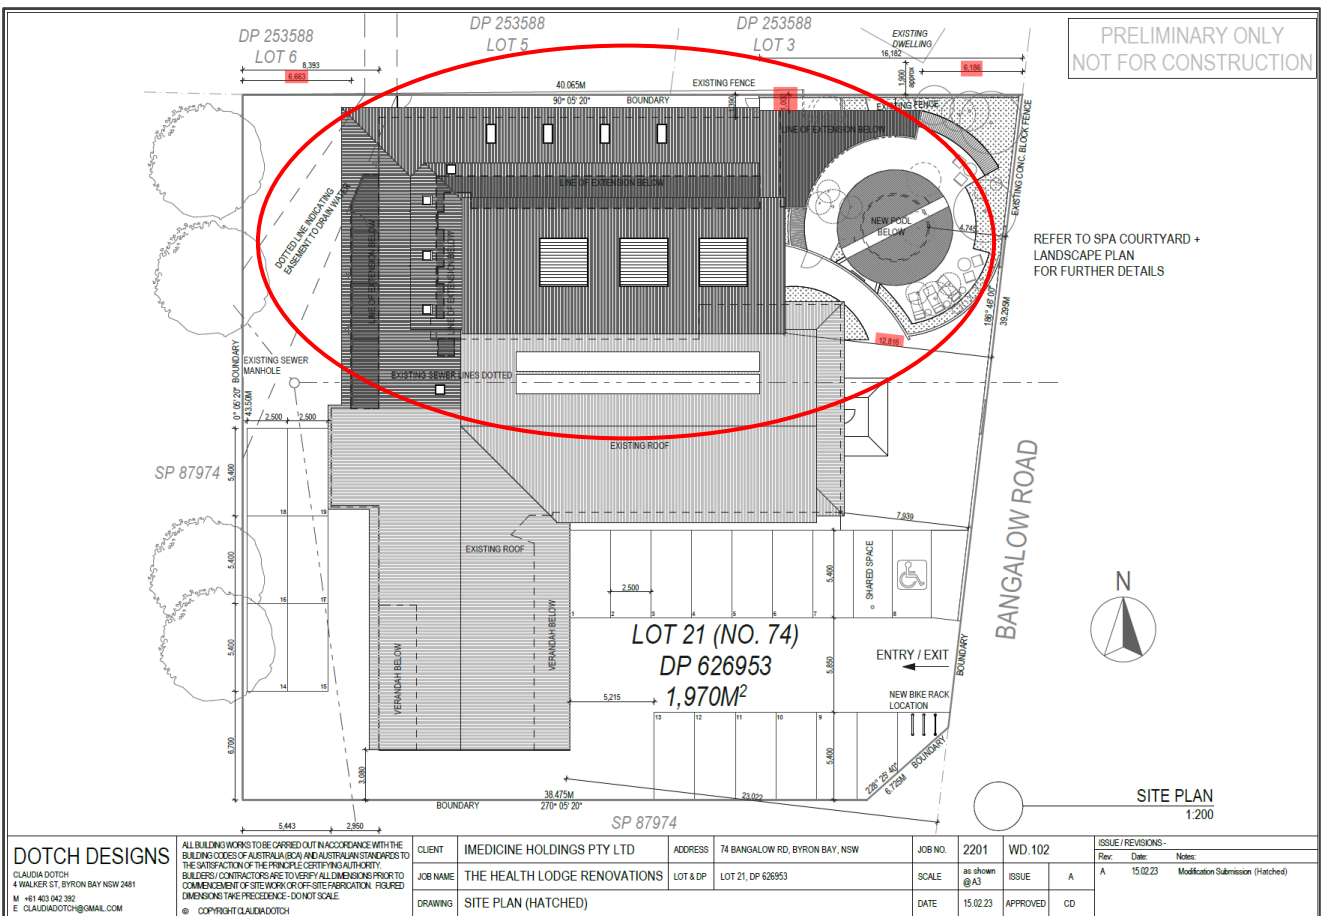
Site plan with location of proposed development (larger image in Appendix D)
